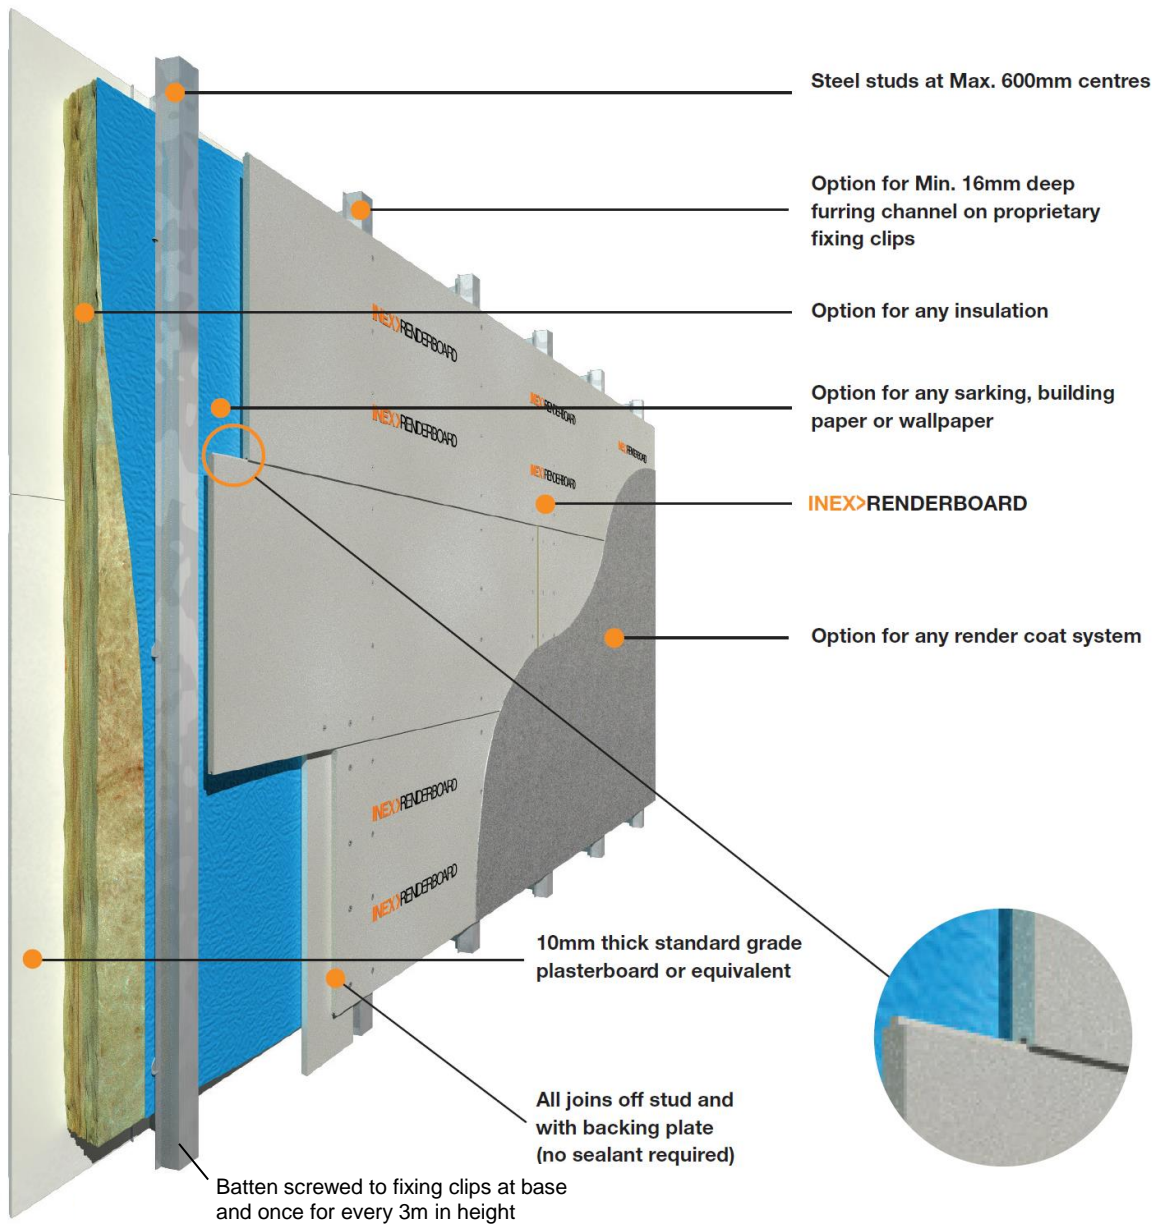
Horizontal INEX>RENDERBOARD Wall System Steel Frame – General Arrangement
